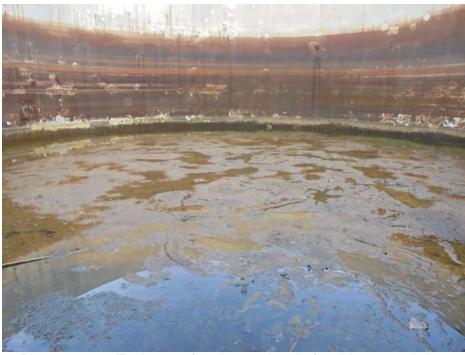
Tank-110 after dewatering, before bioaccumulation removal
